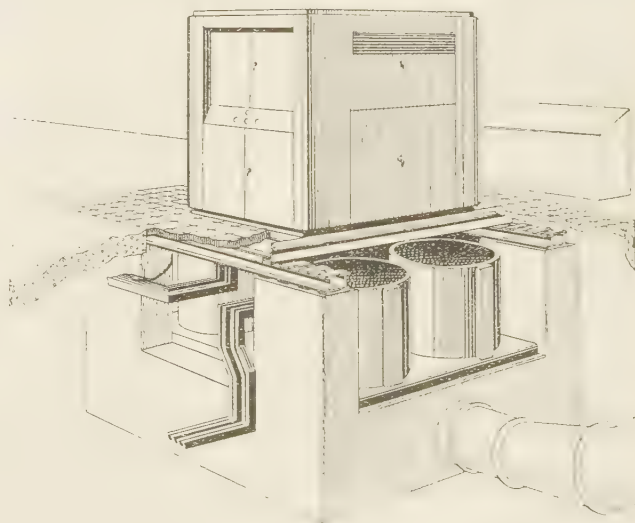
Isometric view of assembly of mechanical unit and comreactors.
